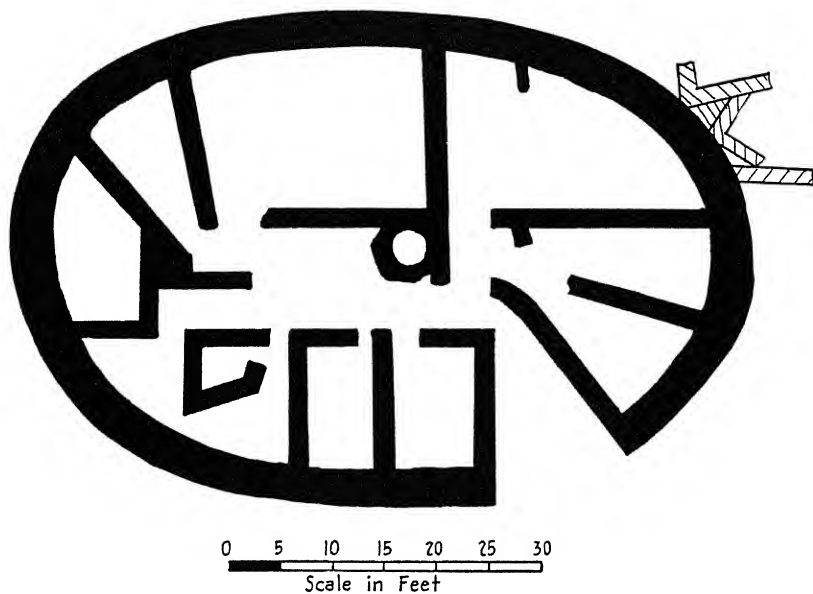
PLAN, OVAL HOUSE AT CHAMAIZI
